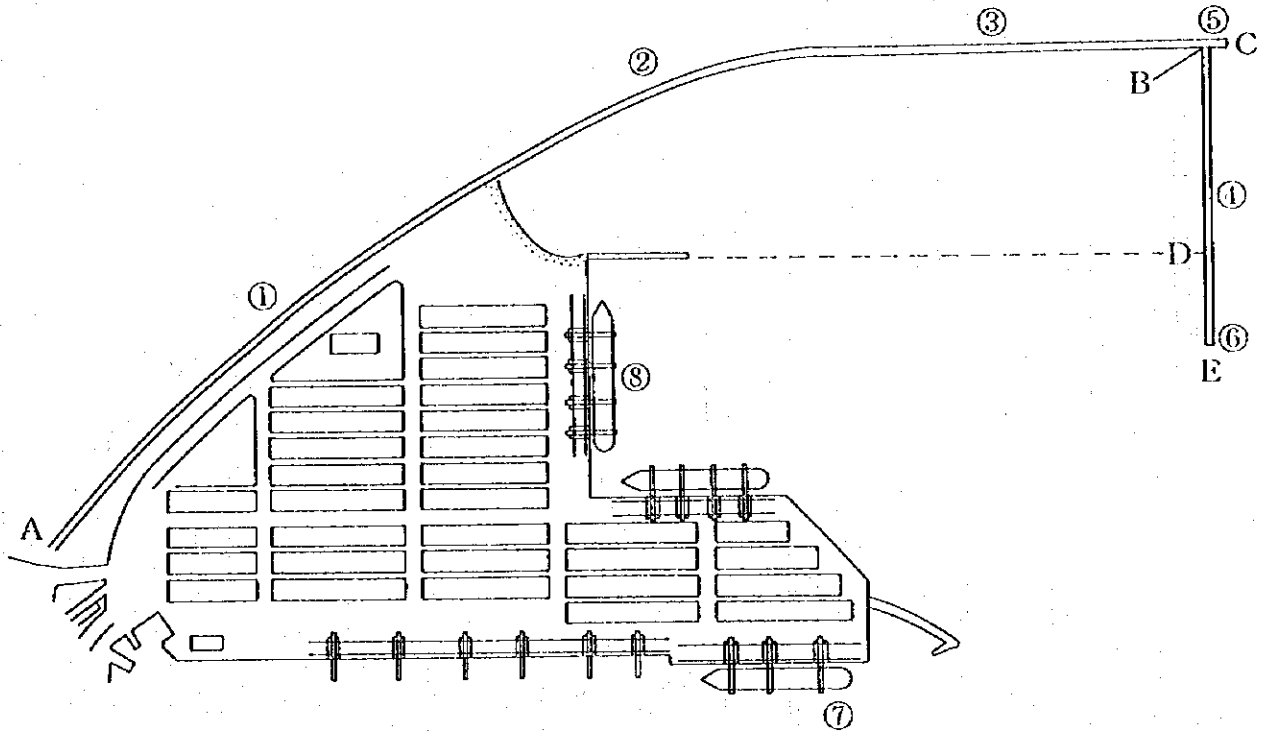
Layout Plan (Seawall, Breakwater and Quaywall)
